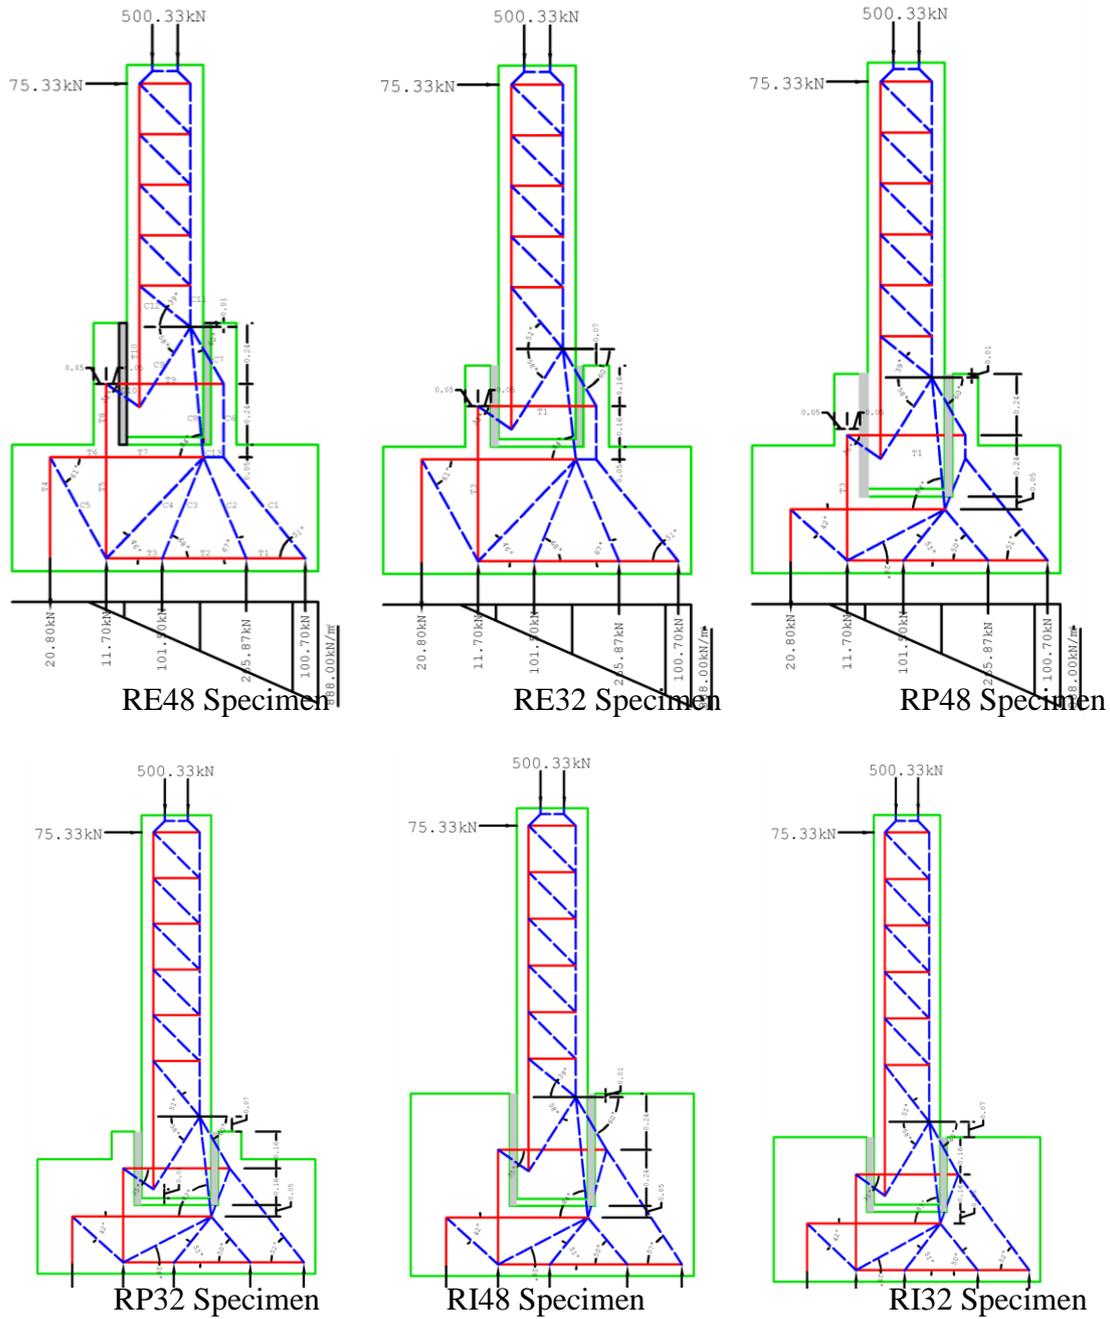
Strut and Tie Design Models Adopted to Test Specimens
